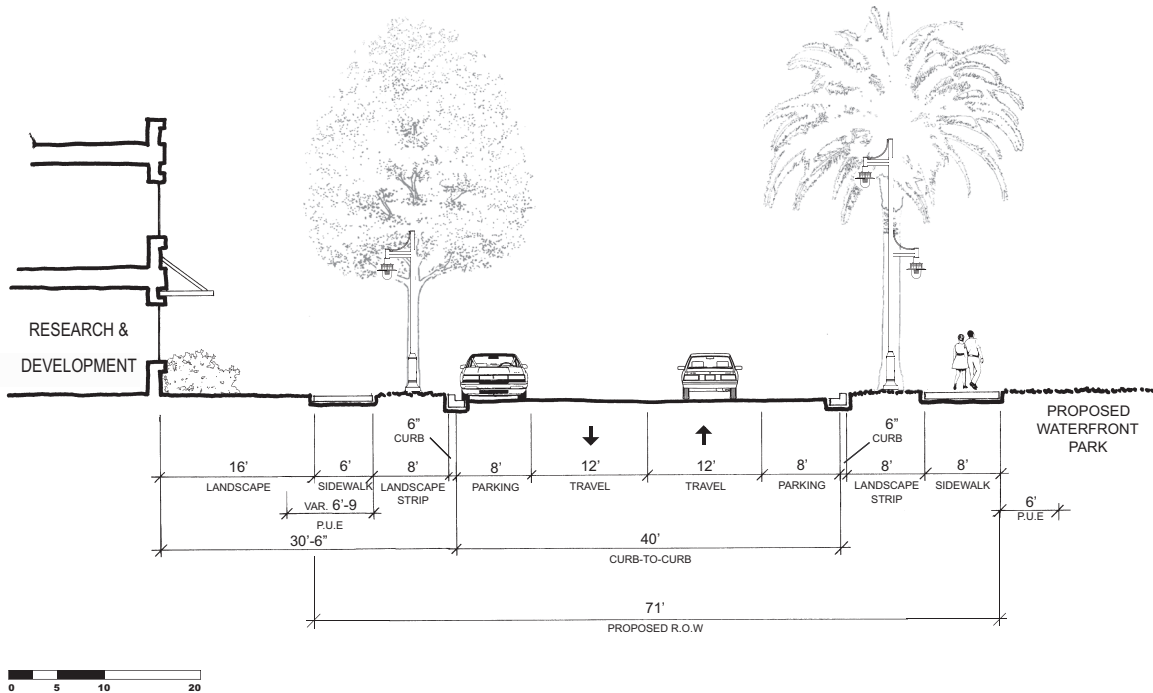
B.17: Section of Marin Street Extension North of Kaiser Place (3)
